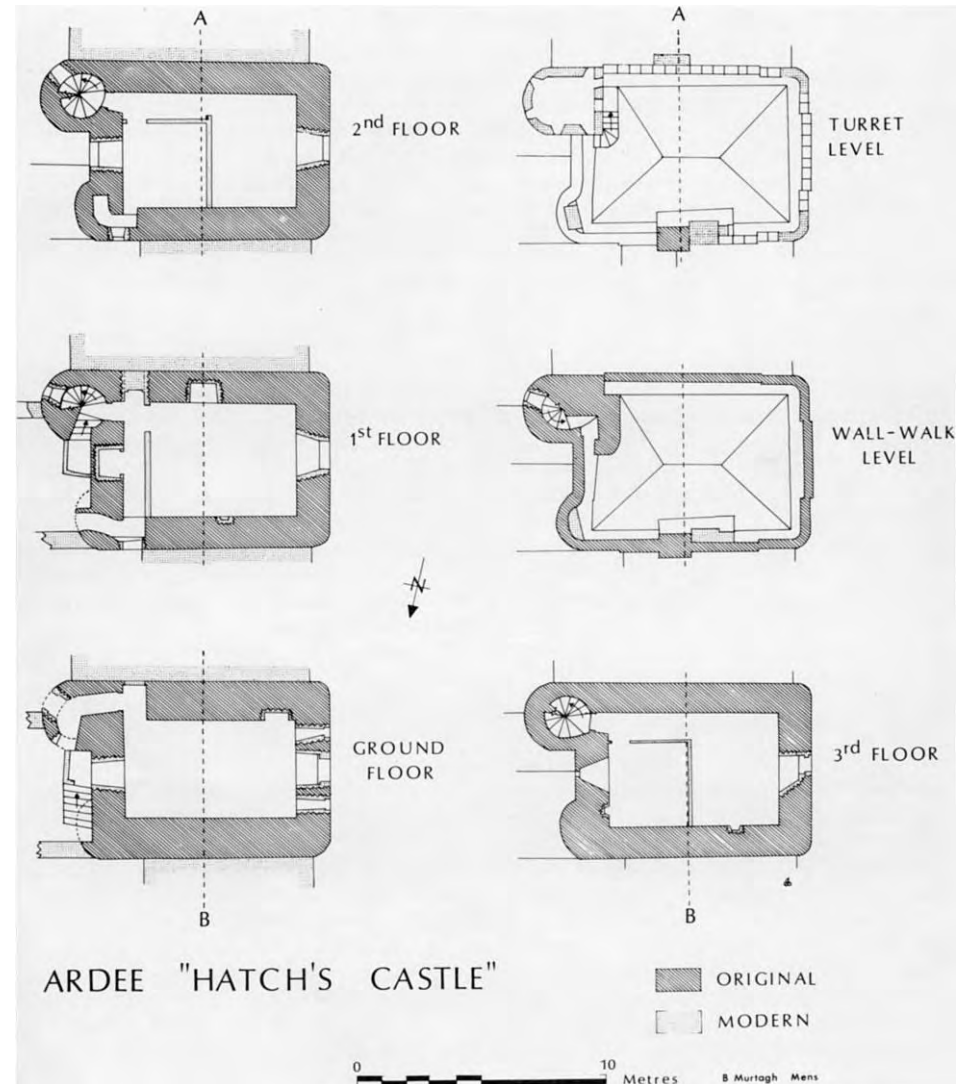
Floor plans of Hatch's Castle, from Murtagh
